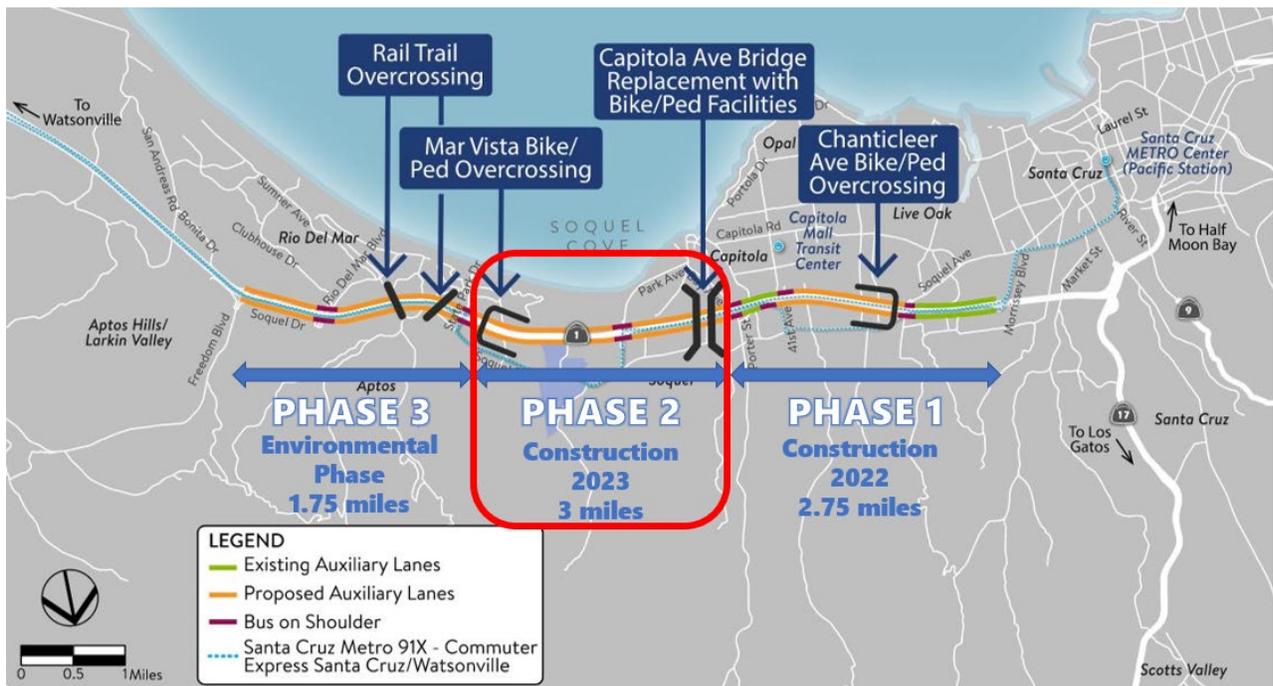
Phase 2 Project includes auxiliary lanes and a bus on shoulder facility in both directions of Highway 1 (State Park Drive to Bay Avenue/Porter Street), replacement of the Capitola Avenue local roadway overcrossing, retaining walls, soundwalls, and a new bicycle/pedestrian overcrossing at Mar Vista Drive.
